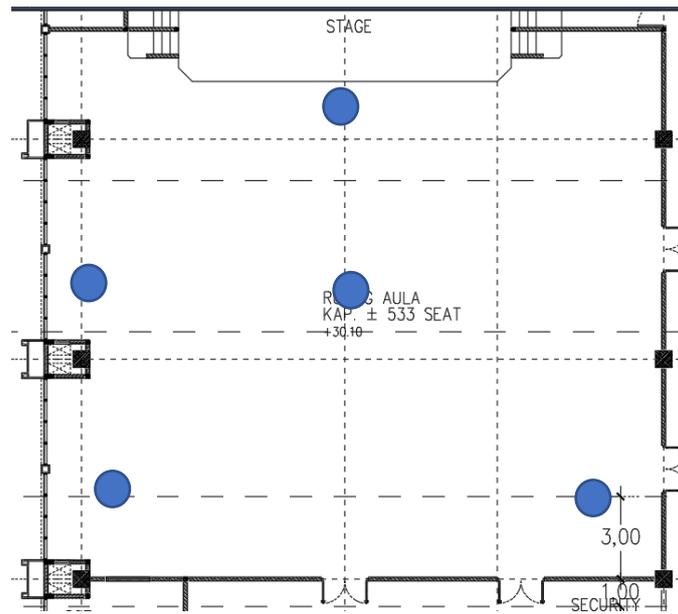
Existing Floor Plan of the 8th Floor Hall of GKB 2
